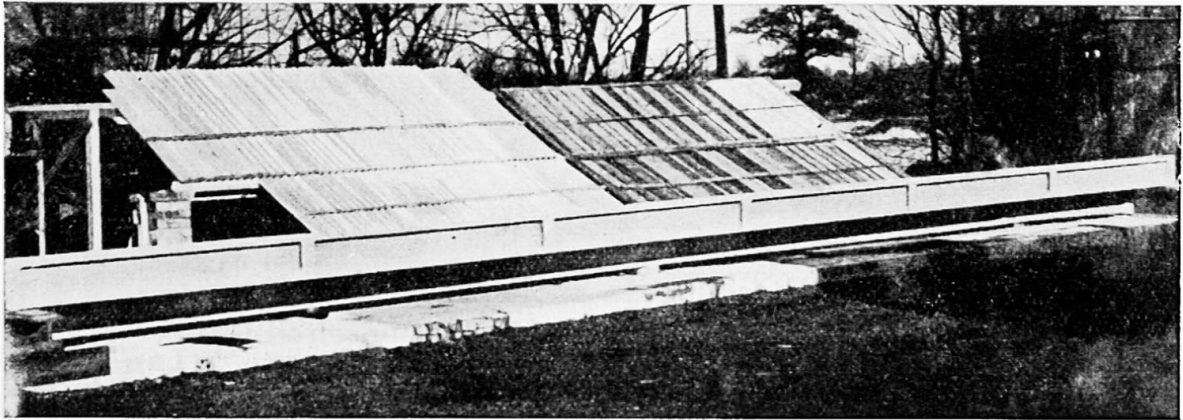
Prestressed concrete joist. Depth-span ratio 1:45.
